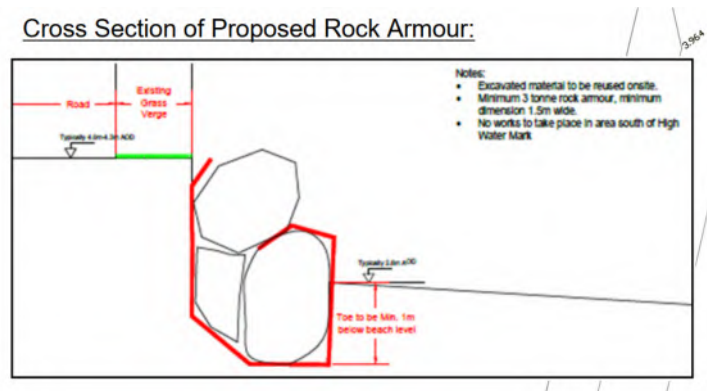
Extract of civil engineering drawings for proposed Coastal Works at Ballynamony (Murphy), Ballagan showing section through proposed rock armour
